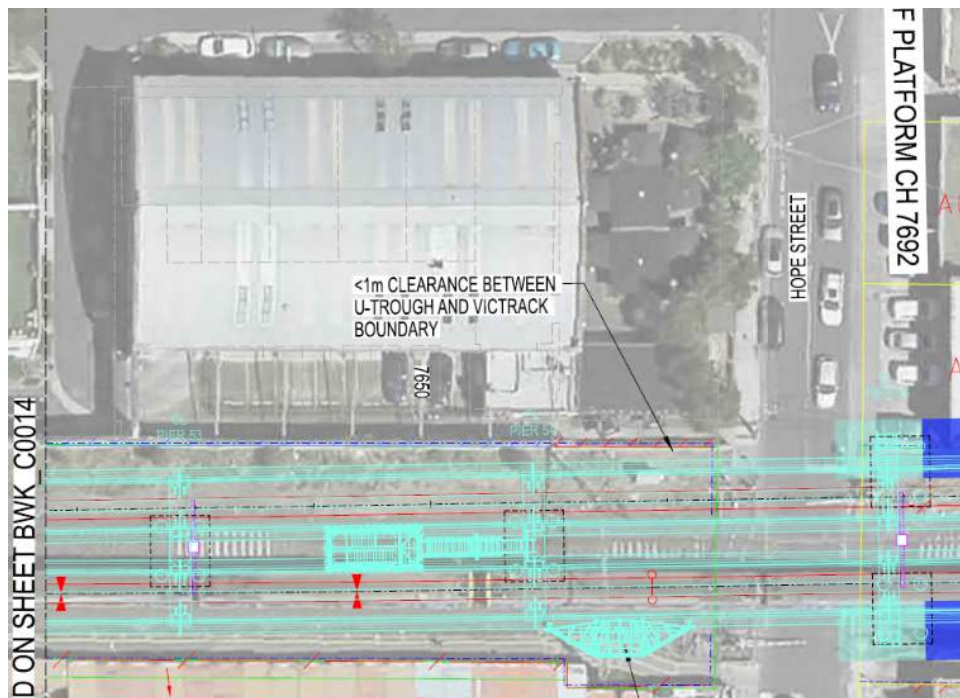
Extract from layout plan showing Former Brunswick Gas & Coke Company Retort House, showing new works adjacent. Note: north is to the right of the image. ('Brunswick EES Referral Boundary' Mapbooks (RevM))
